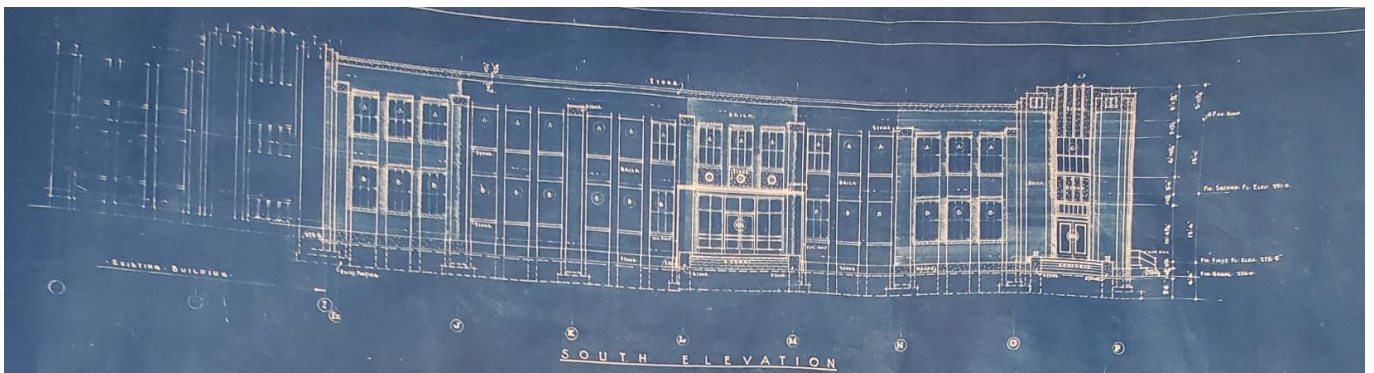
Plan of the principal (south) elevation of the addition to the manufacturing building, Mathers & Haldenby, 1944 (Courtesy of the Archives of Ontario)
